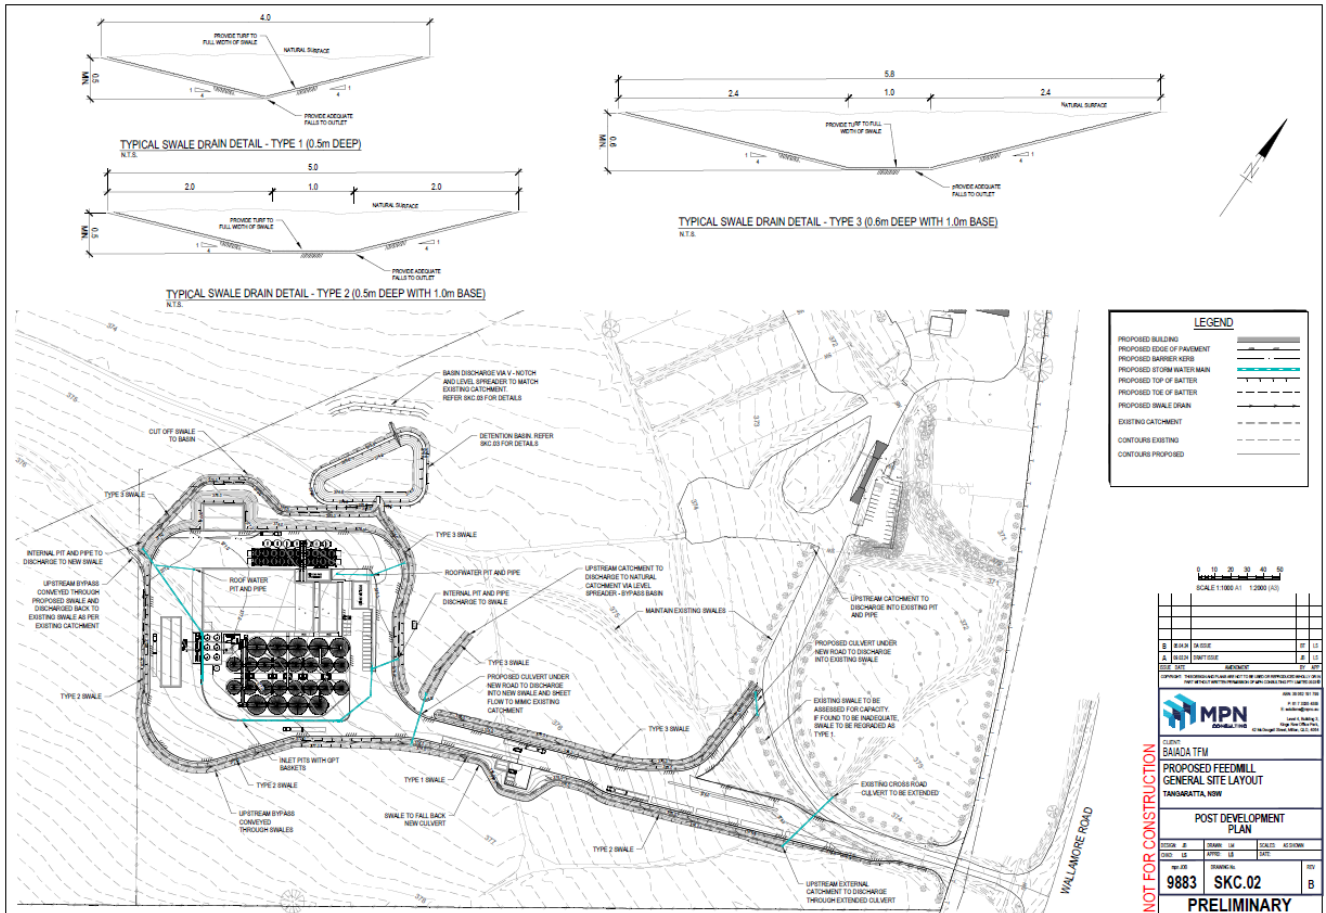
Stormwater Management Plan (MPN Consulting, 2024)
